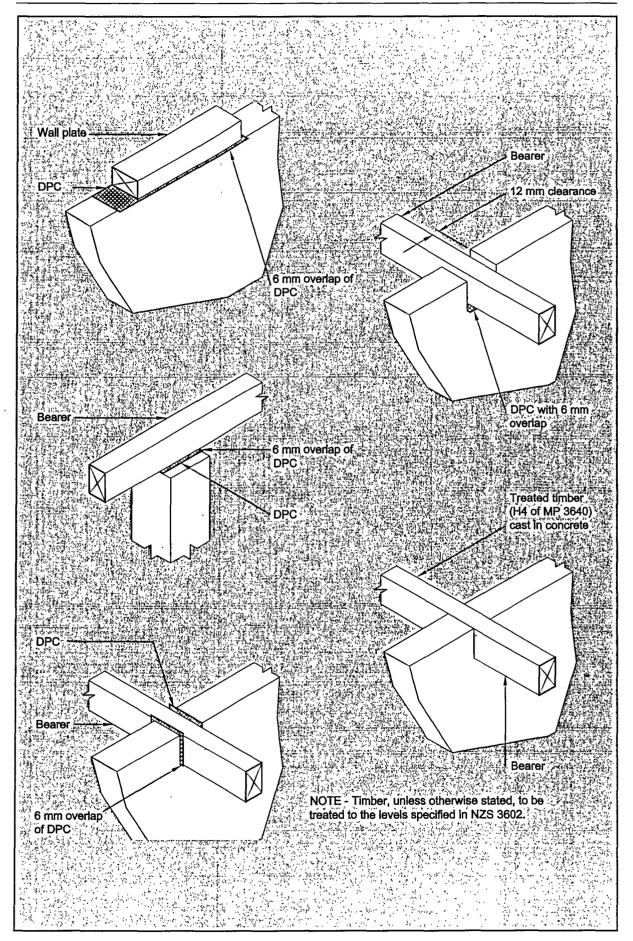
Protection of subfloor framing timber from direct contact with concrete (see 2.3.3)
